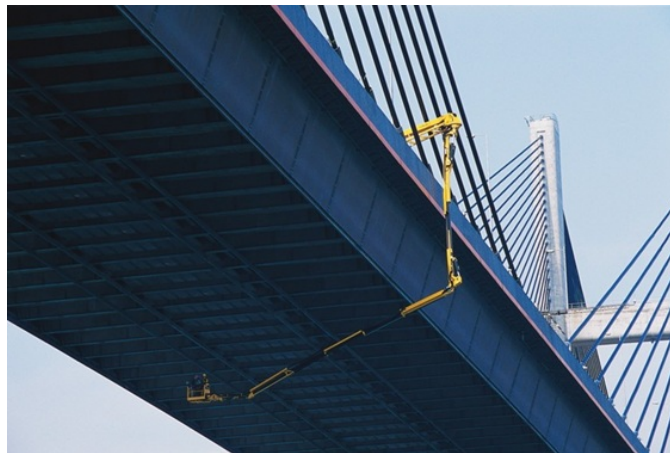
Palfinger’s vehicle-mounted bridge inspection lift performing maintenance under a bridge. ¹⁴
